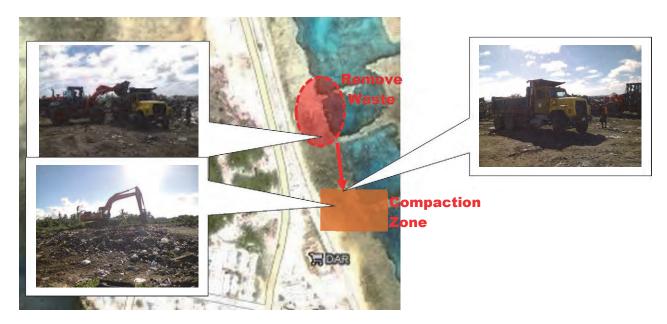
Improvement plan at the dump site (Revised in October 2014)
